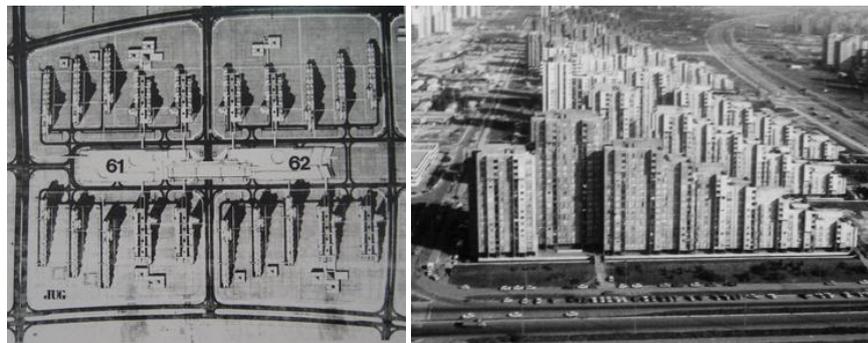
The initially planned structures along the Boulevard of Jurija Gagarina: (left) blocks 61 and 62 – plan, (right) typical block.
